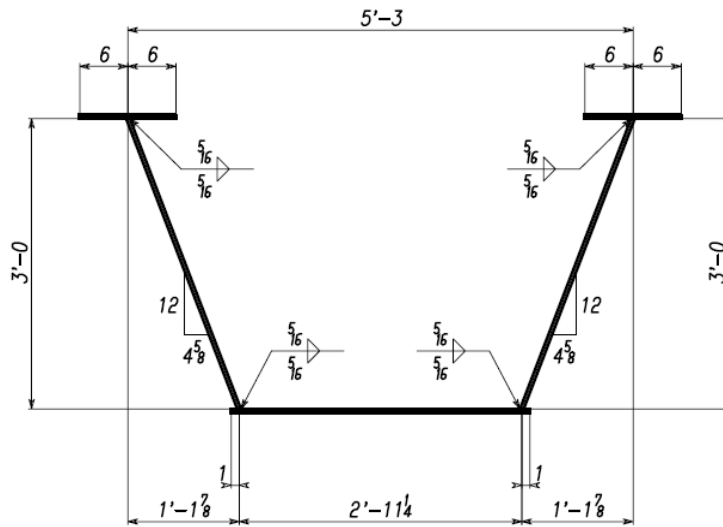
Full-Scale Flatter Web Tub Girder Specimen - Cross Section
